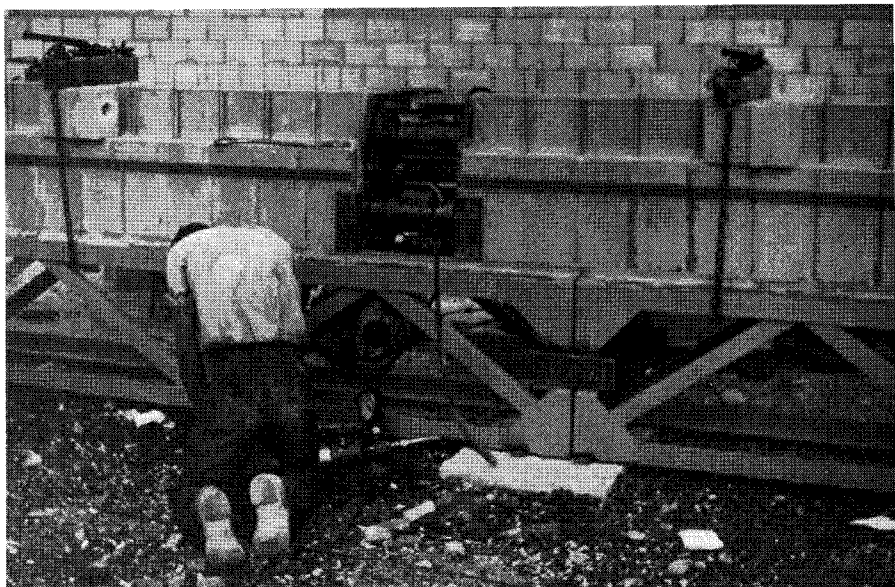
Tensioning two 16x24-in. (406 x 610 mm) block building beams by jacking them apart.
